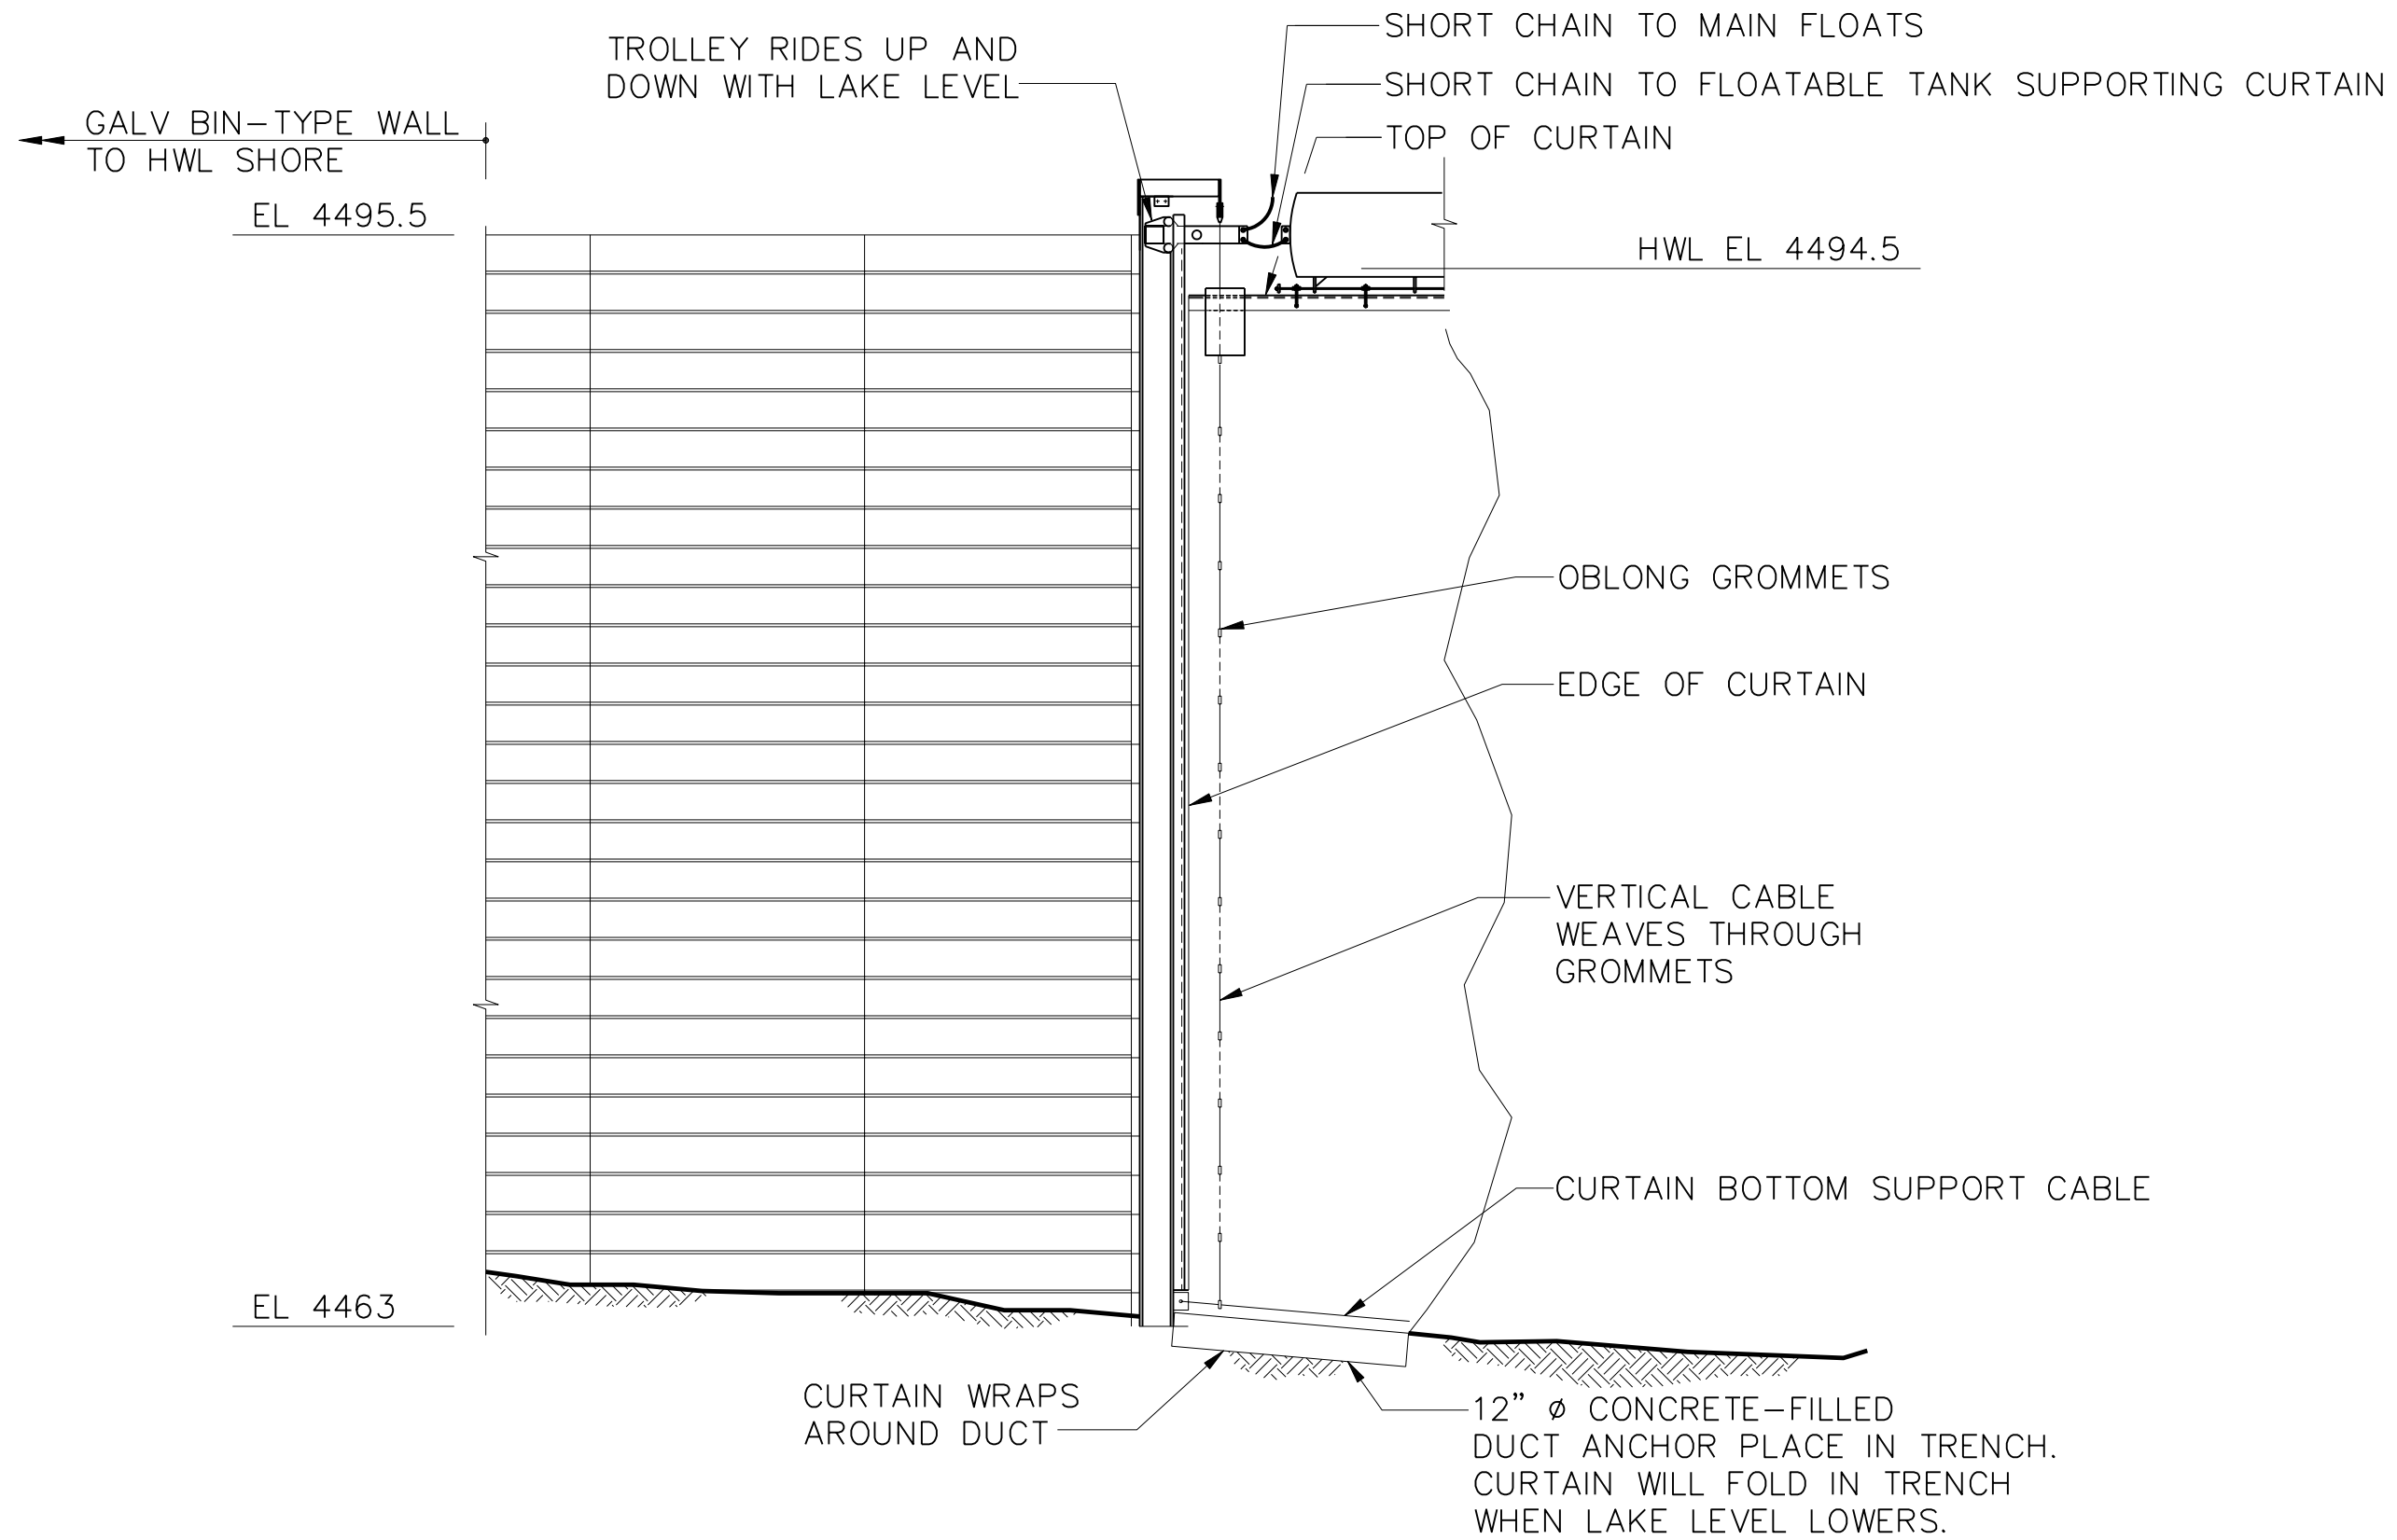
Trolley Beam at End of Bin-Type Wall of Prattville Intake Thermal Curtain
